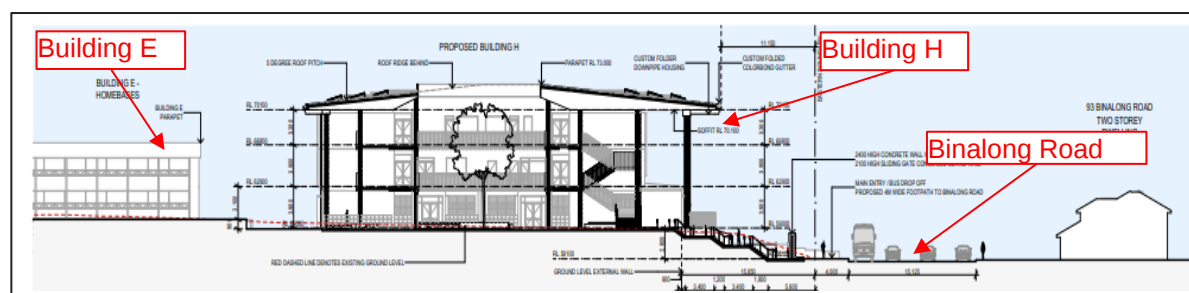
| East-West Section (Source: Applicant's RtS 2021)
